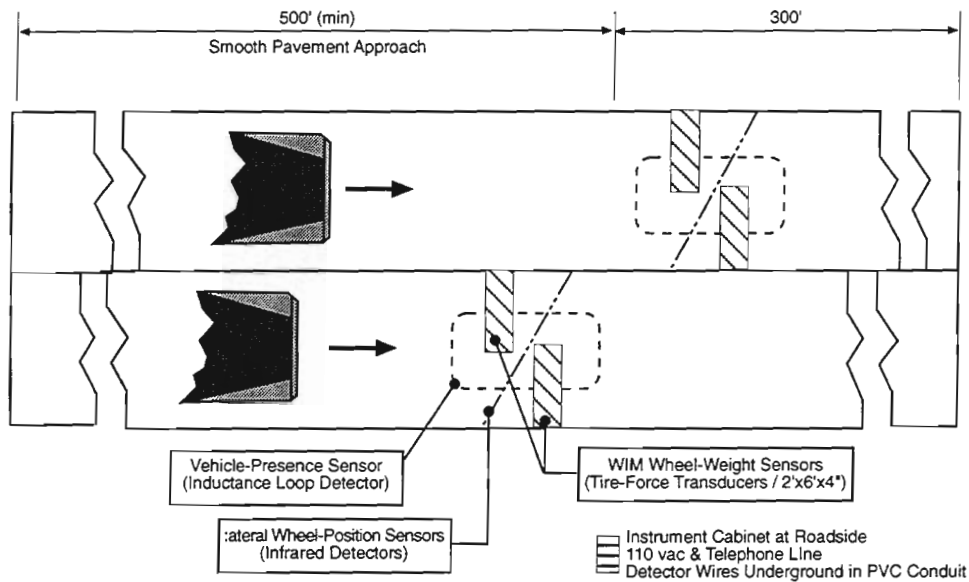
Layout of WIM equipment (1 ft=0.304 m, 1 in.=2.54 cm)
